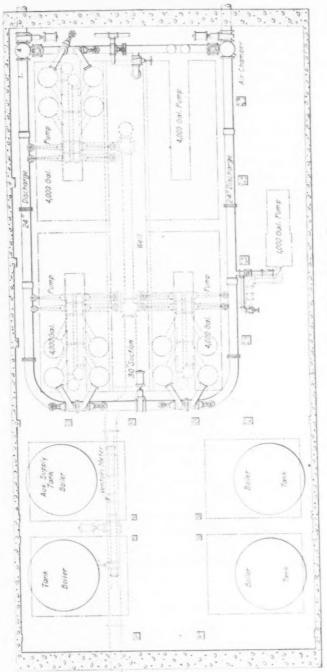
PLAN OF STATION, SHOWING WATER PIPING
